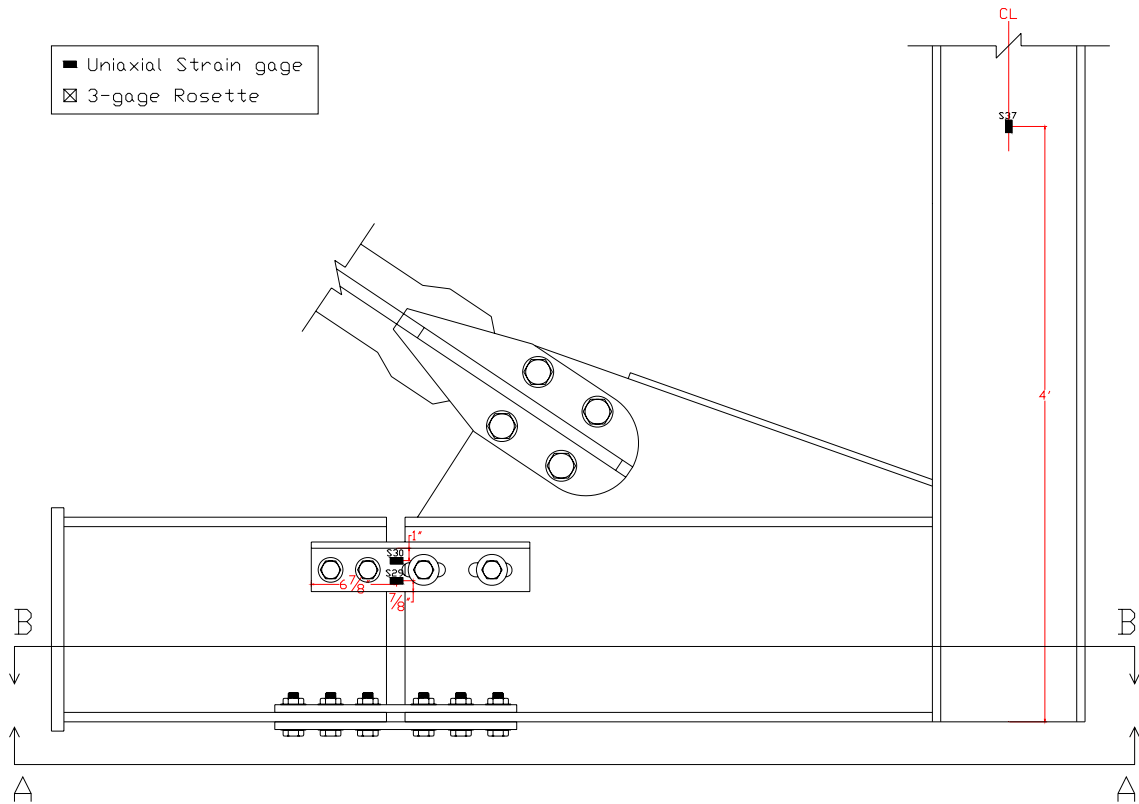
Specimen 1 – Gusset and Splice Plate Instrumentation
